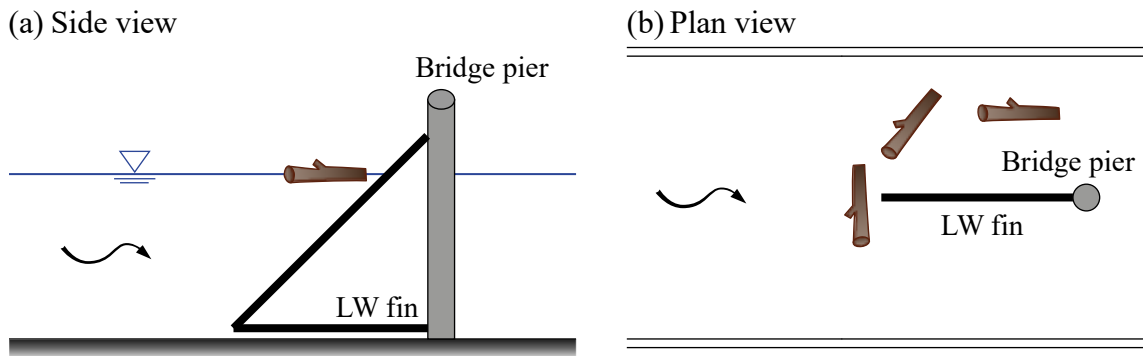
LW fin as a countermeasure to orient transported logs in flow direction, (a) side view and (b) plan view (adapted from Bradley *et al.* 2005)
